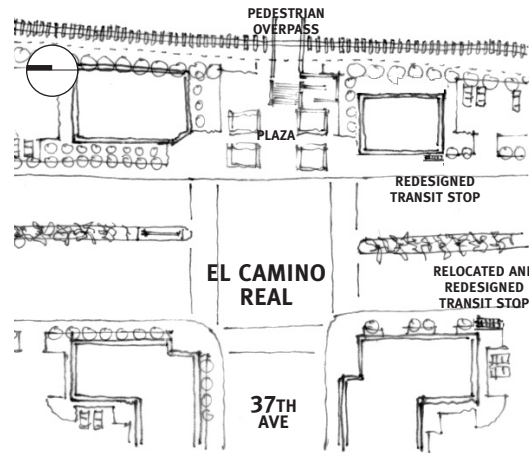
Potential private redevelopment at the 37th Avenue intersection, including additional sidewalk width, landscape setbacks, expanded corner plazas, redesigned transit stops and a Caltrain pedestrian overpass.
